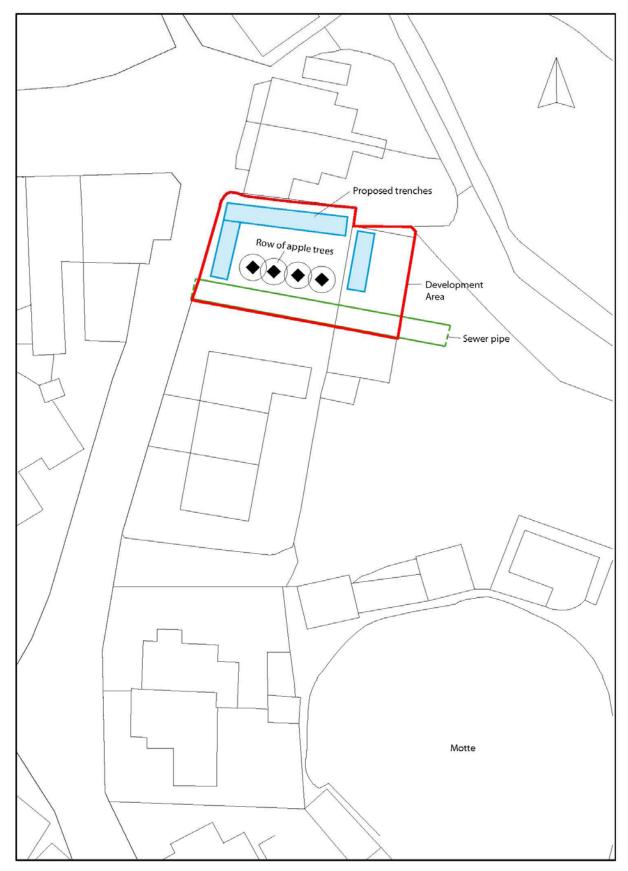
Suggested layout of proposed evaluation trenches (blue), avoiding apple trees and sewer pipe (green). 1:375
